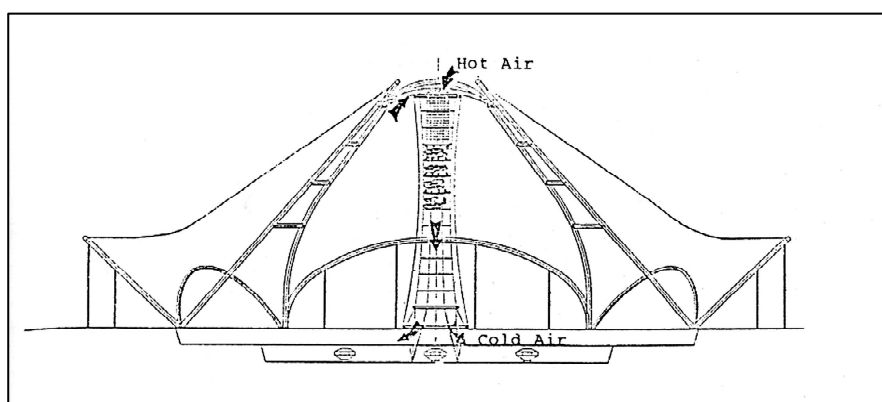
Air handling units in the floor and tower (Source: Alvarez ^{12,12})
